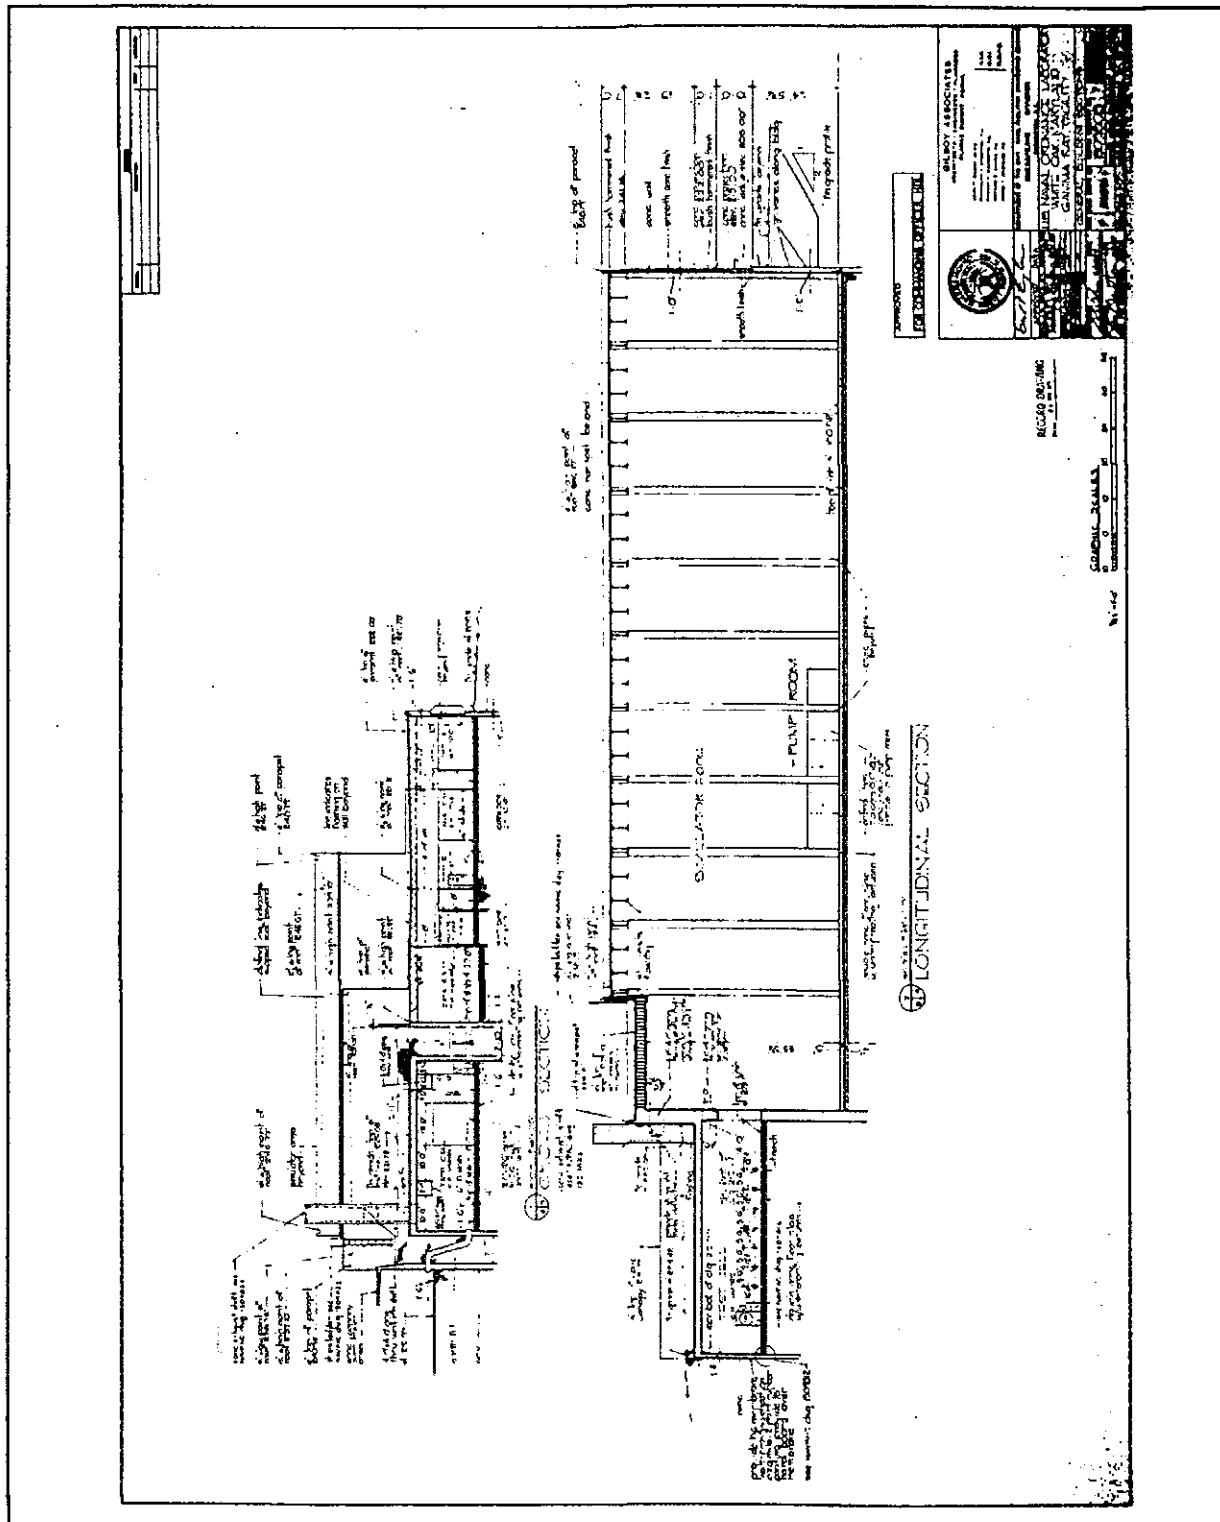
, U.S. Naval Ordnance Laboratory, White Oak, Maryland, Gamma Ray Facility, main elevations, 1969.
